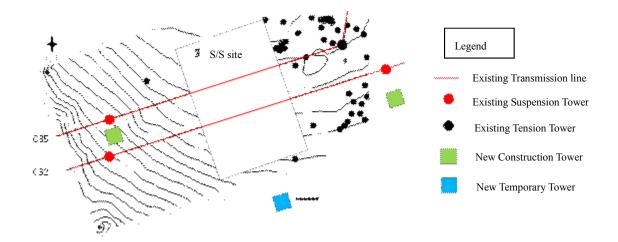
Location of the Namialo substation, new towers and tentative tower
